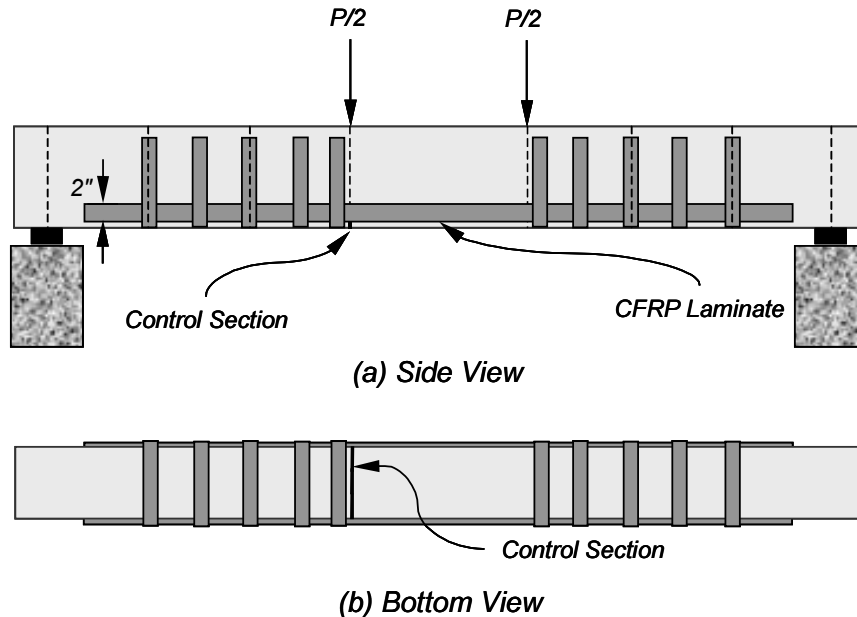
Schematic of Specimen with CFRP Bonded to Sides and Anchorage Using Vertical Straps
